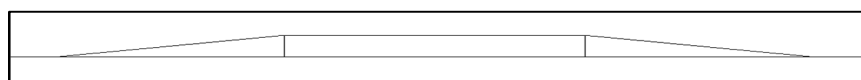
Side View (Section Z-Z) Road Surface with Grade.
